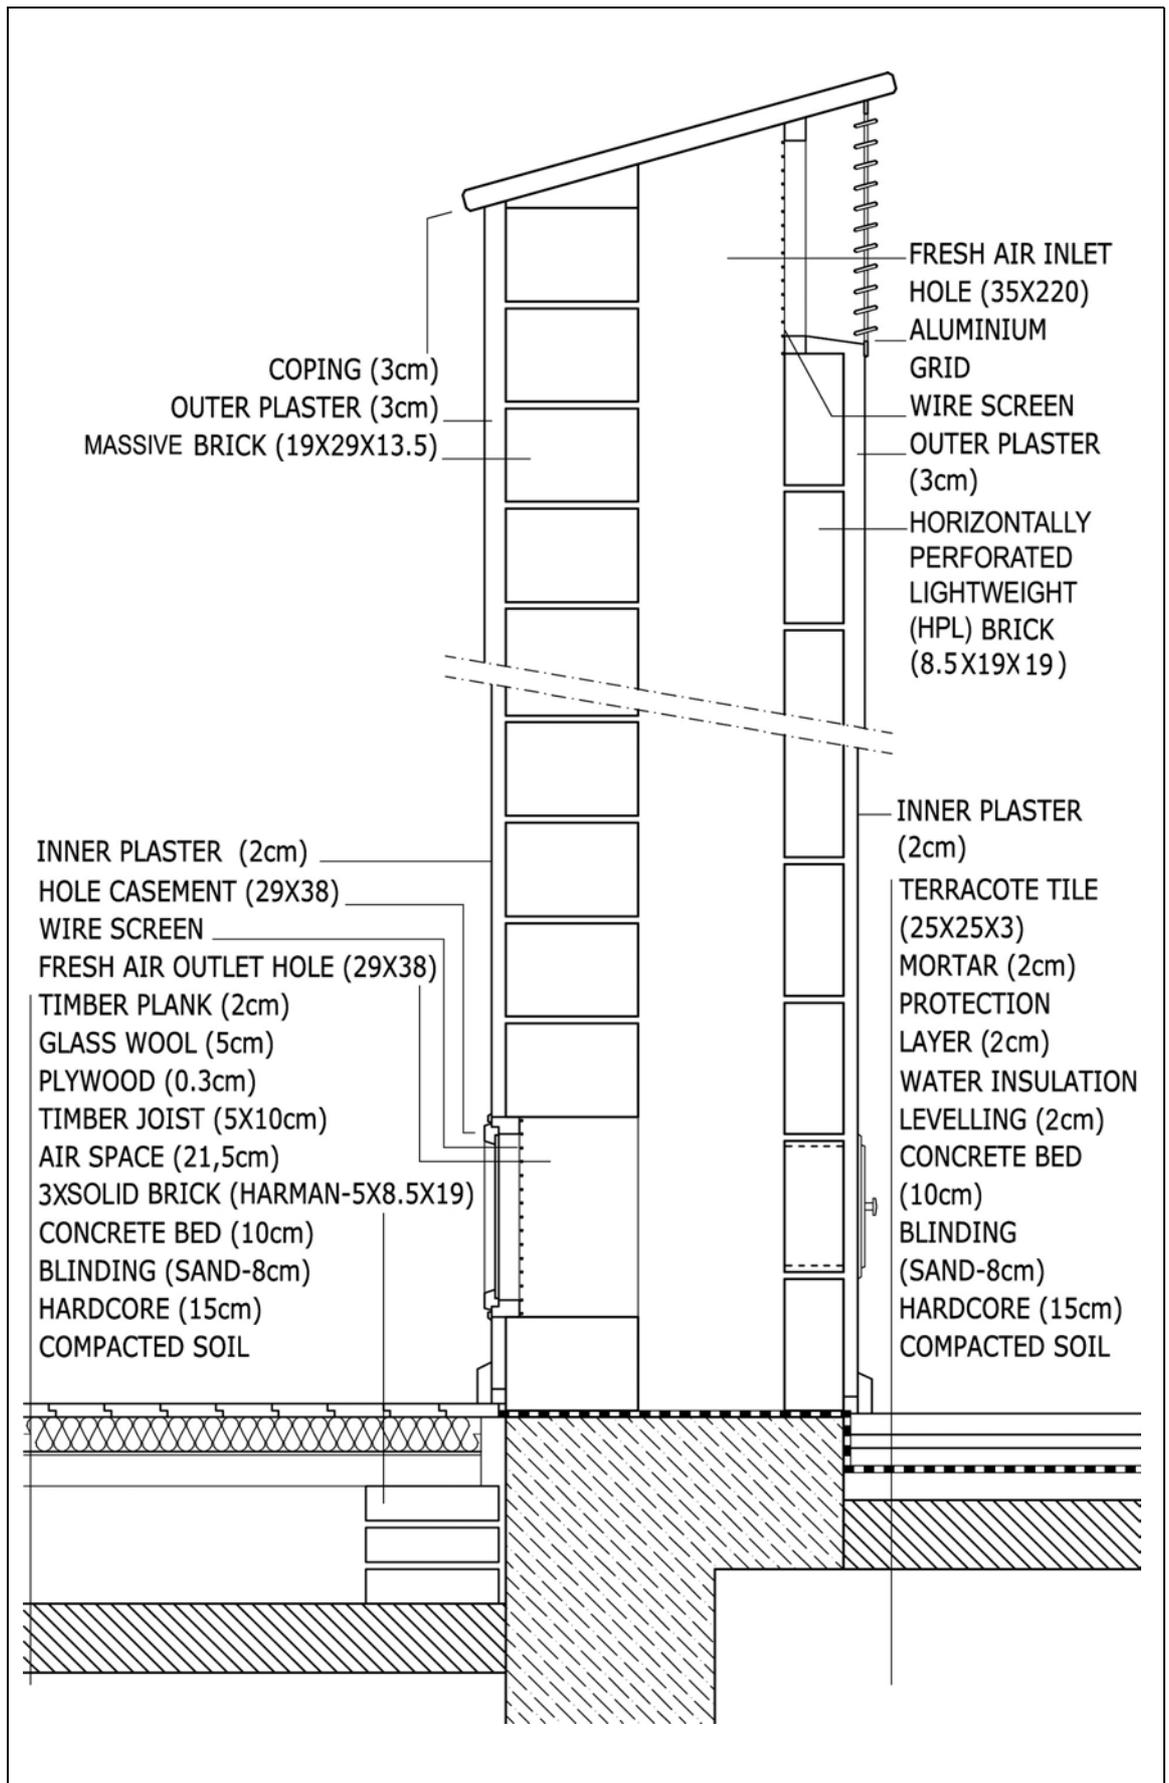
Ventilation chimney of the sample dwelling forcing inner natural air movement; Scale 1/10
